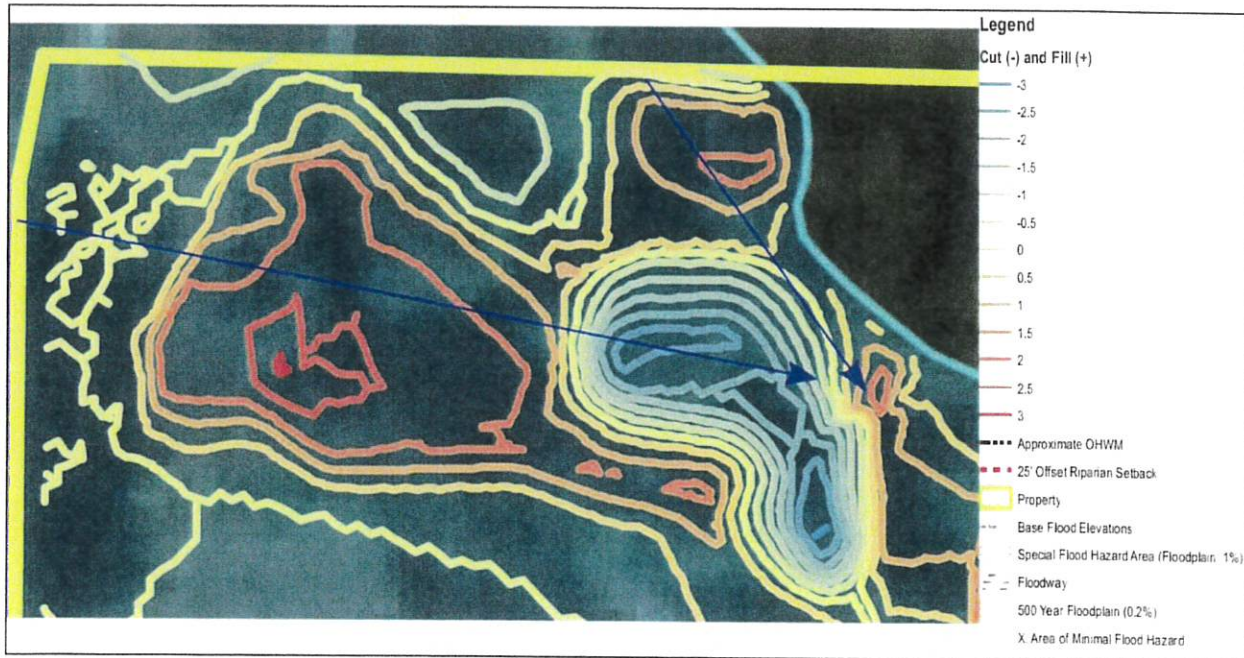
Proposed grading cut and fill quantities showing up to 3 feet of fill to be placed blocking natural drainage patterns (highlighted with blue arrows). Source: Brockway Engineering, PLLC.
